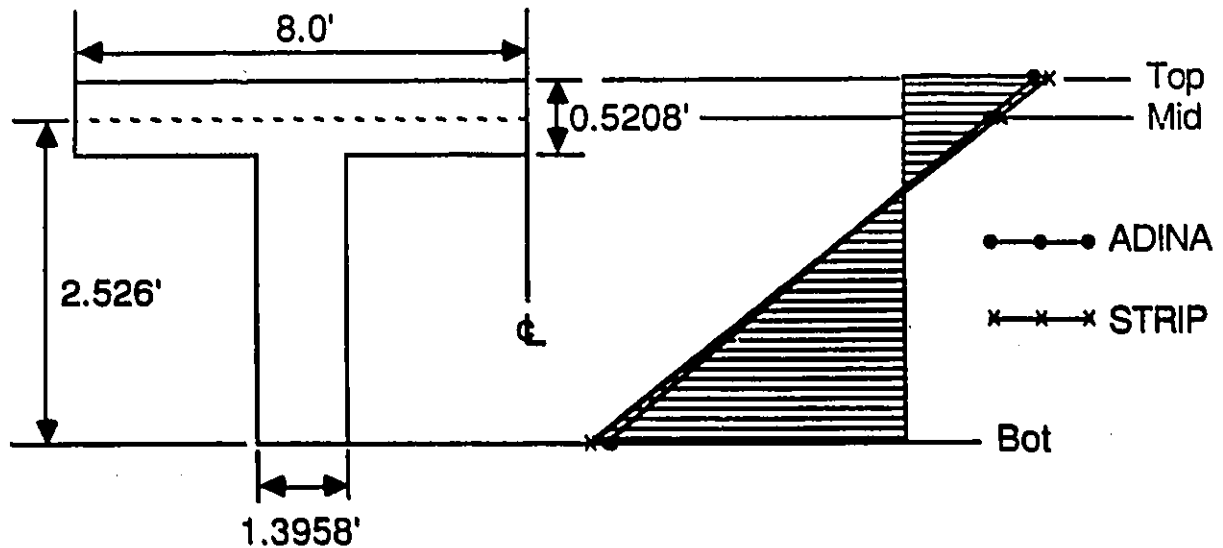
LOADS AND LAYOUT OF EXAMPLE 5.3.4
